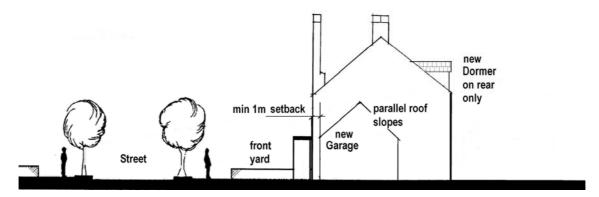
Side view – a new garage must be set back at least 600mm from the front façade of a dwelling. Roofs must be parallel with the slope of the existing roof and use the same roofing material. Any new dormers in roof spaces must be at the rear only.
